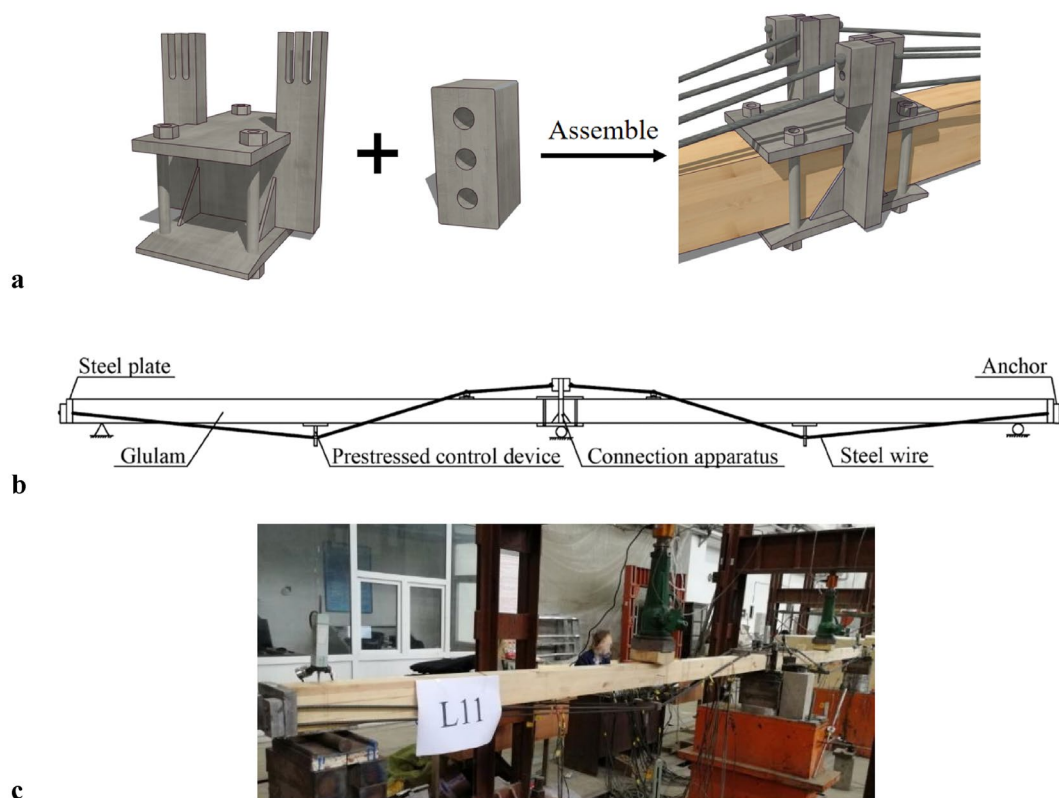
Prestressed glulam continuous beam. a Details of connection apparatus; b details of the specimen; c photo of the specimen
